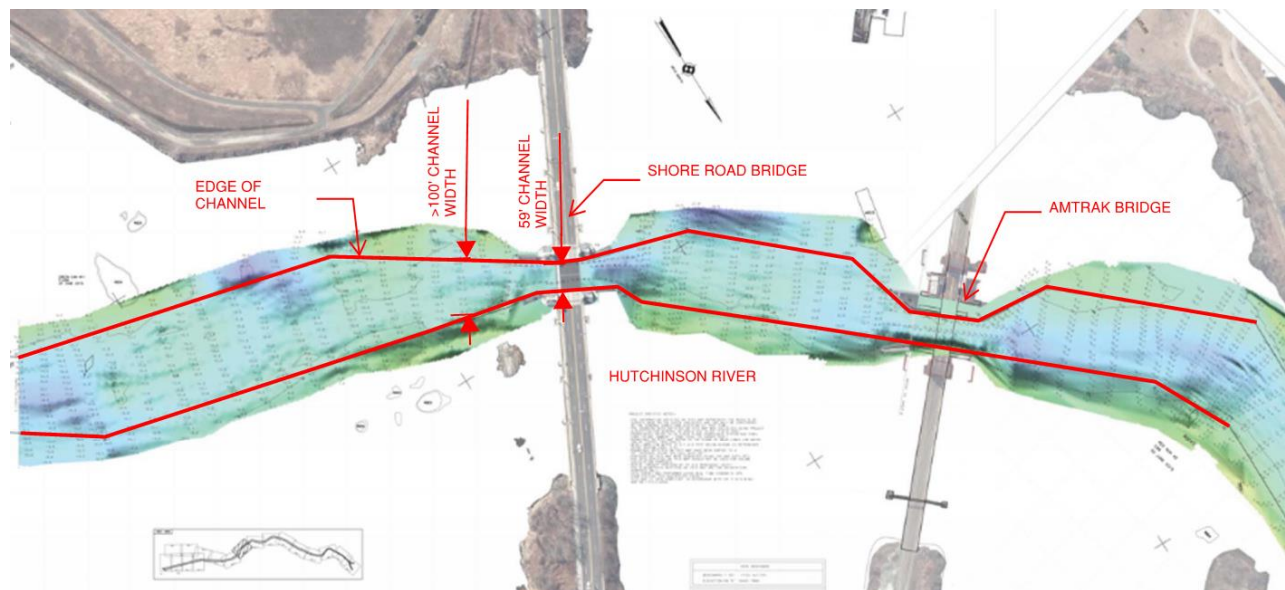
Narrow channel width of Shore Road Bridge over Hutchinson River and the adjoining Amtrak Bridge. Source: 2015 Channel Survey – Eastchester Creek
